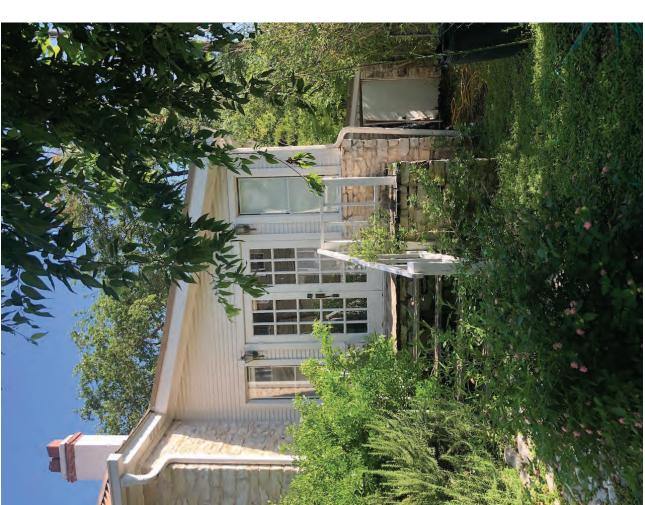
South elevation view of modern addition; unknown construction date (camera facing north). Photo taken May 5, 2019
